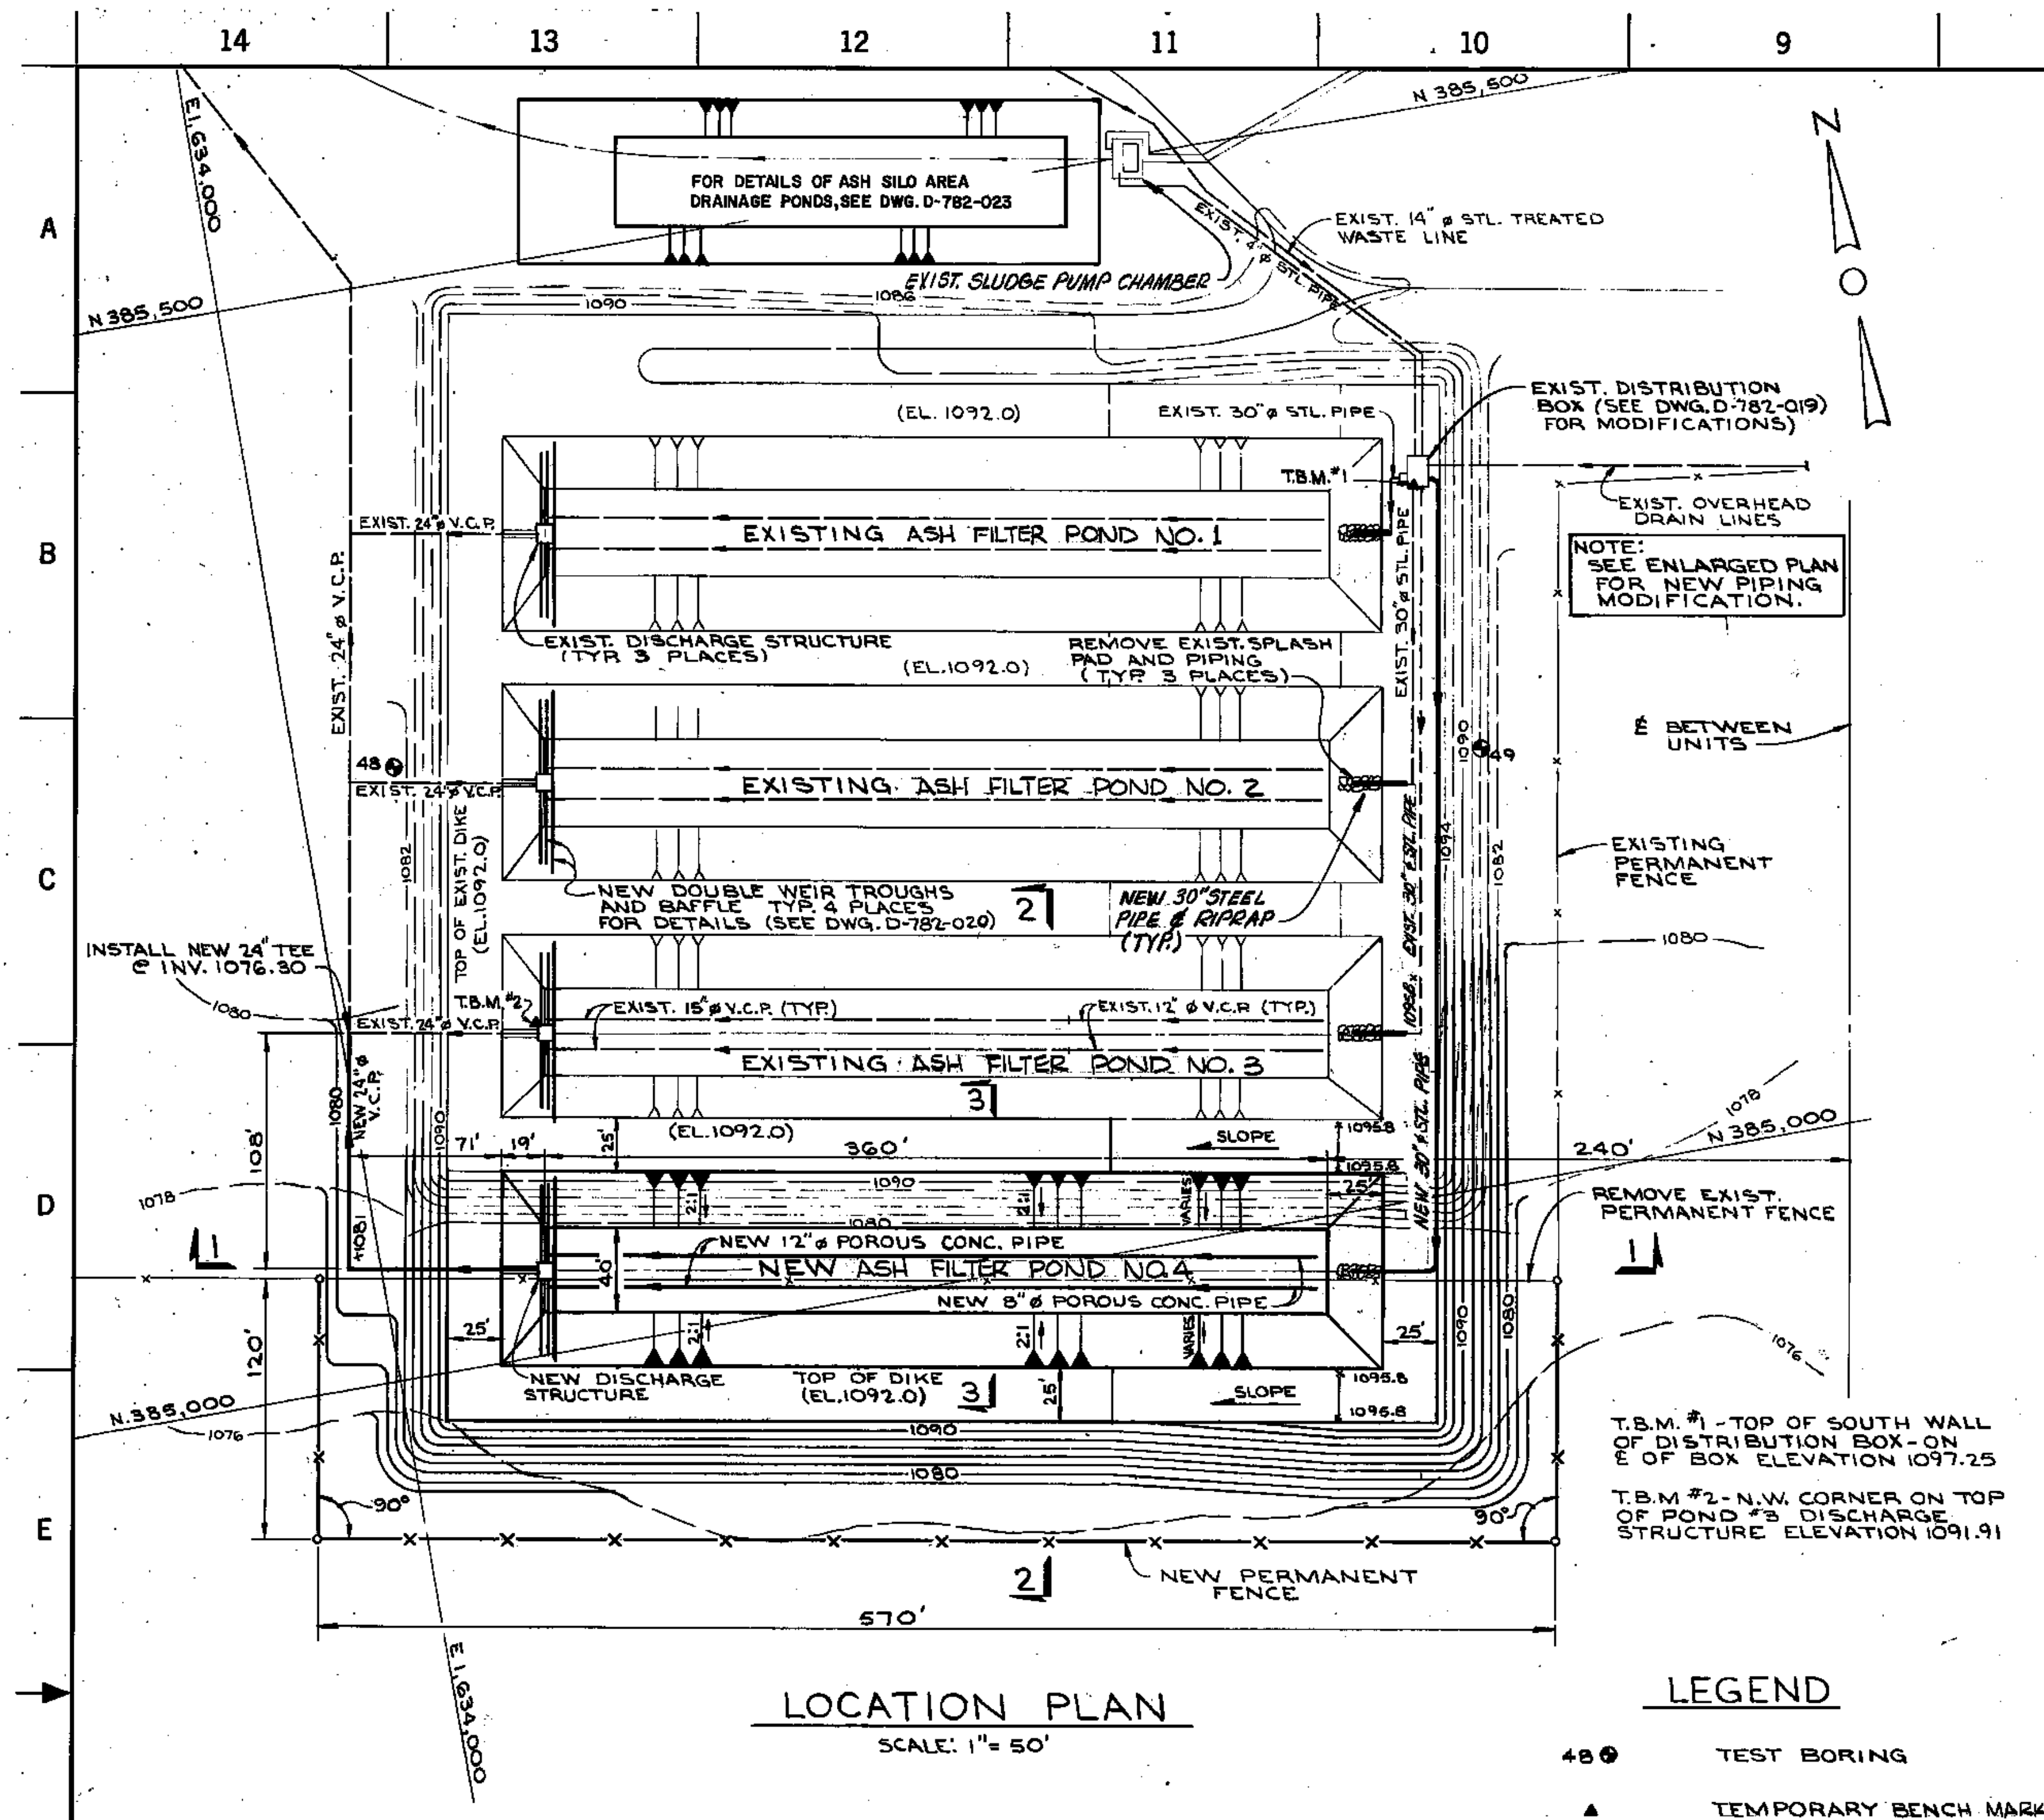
(Roads, Grading and Drainage Plan)
